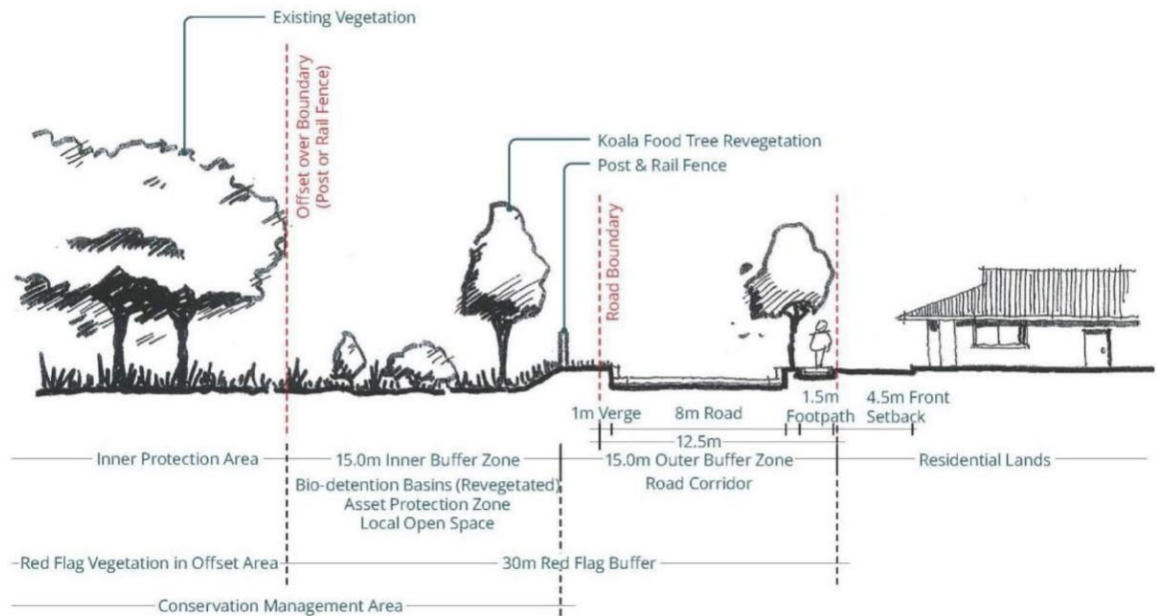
Example of buffer zone at proposed Mount Gilead Stage 2 development (Source: Eco Logical Australia, 2020)
